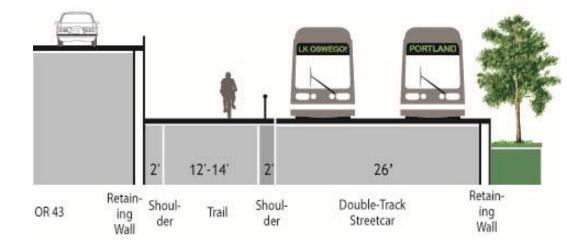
Section 2.1a Willamette Shore Line with Double Track Streetcar
